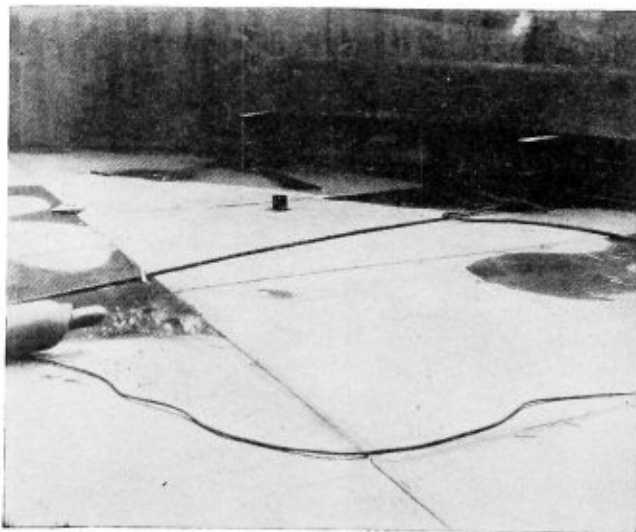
Interior of water tank showing welding and cup construction
